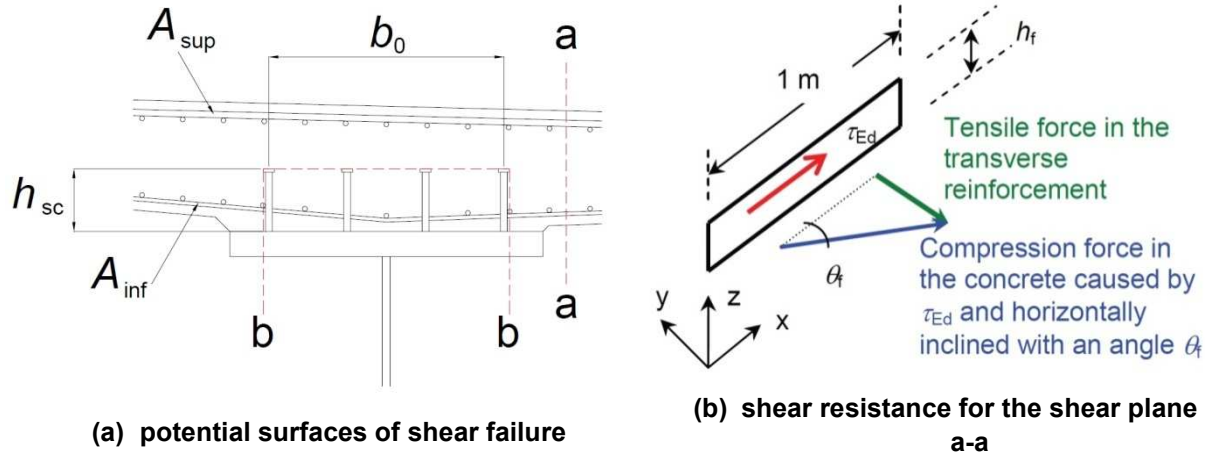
Potential surfaces of shear failure in the concrete slab
